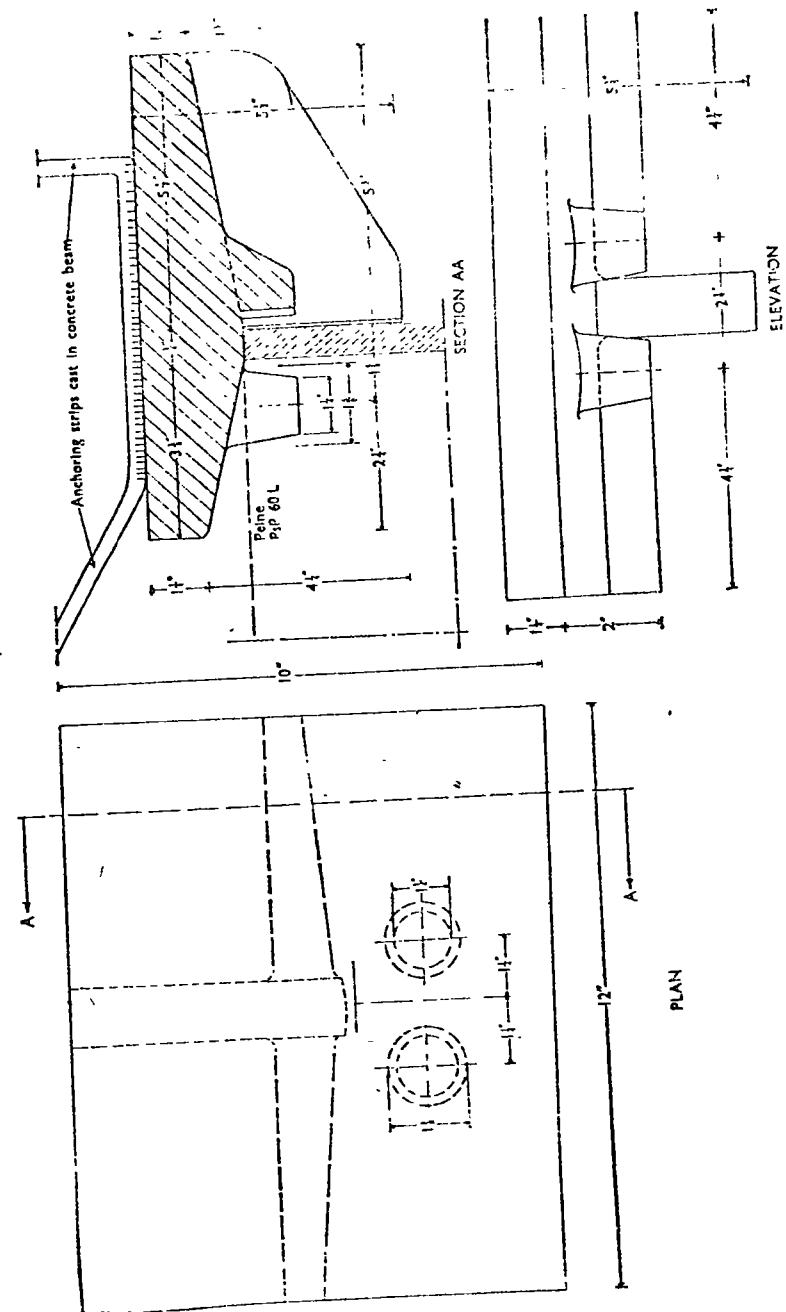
CAST STEEL SADDLE CONNEXION BETWEEN PRE-CAST CONCRETE BEAM AND STEEL SHEET PILING
